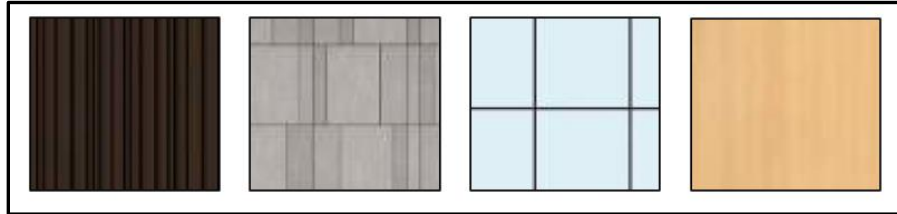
(Left to Right) dark bronze corrugated aluminum panel, stone panel with honed finish, curtain wall glazing, engineered wood panels
